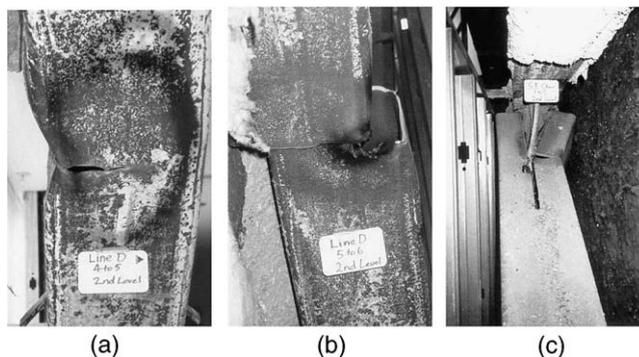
Typical examples of observed damage: (a) Buckled brace, (b) Fractured brace, and (c) Failed brace to girder connection and lateral displacement of girder [8].
